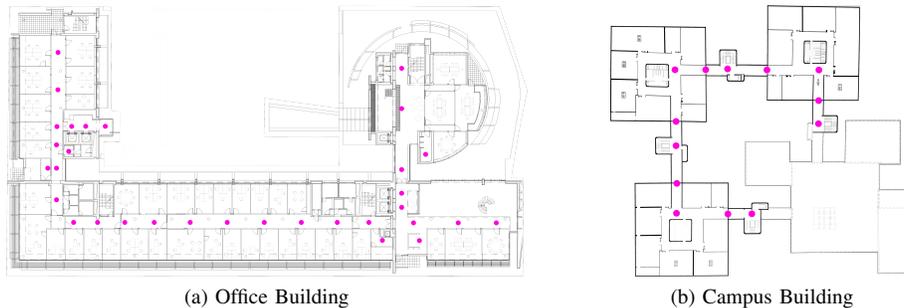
Testbed floorplans and test point locations. (Different floors of each building have similar layouts.)
